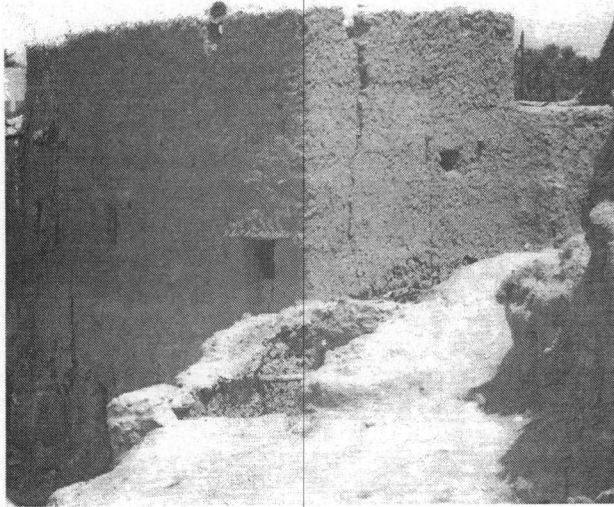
Vertical cracks due to the foundation settlement.
